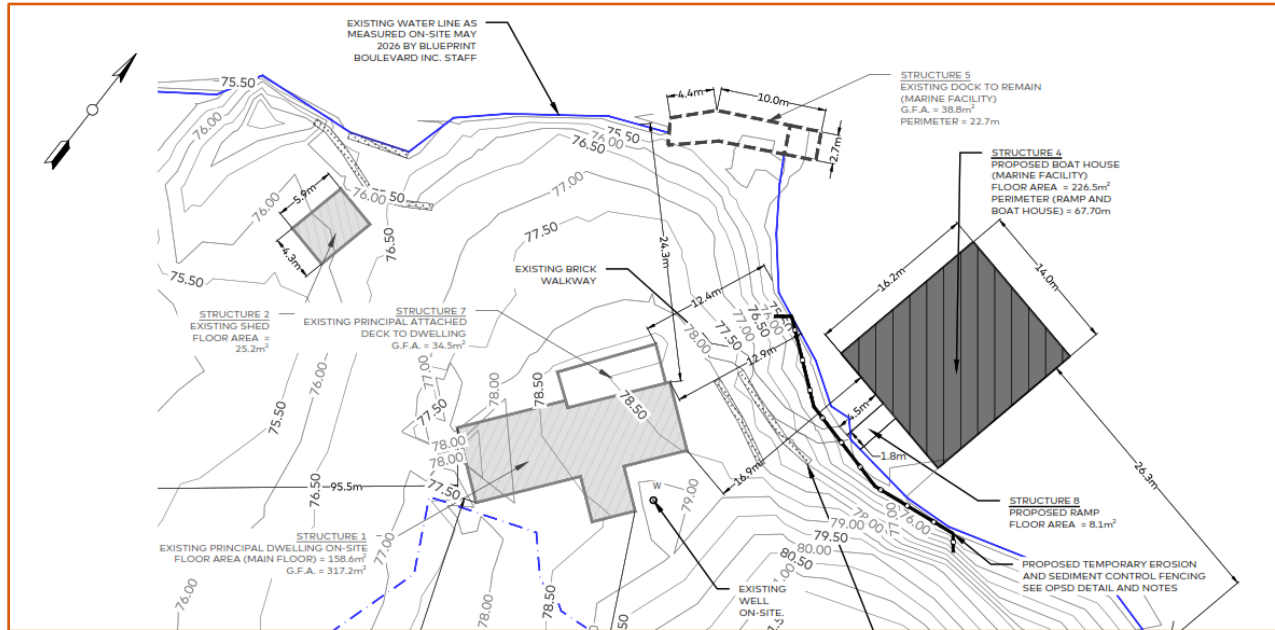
Proposed boathouse shown as Structure 4, proposed ramp shown as Structure 8, and existing dock shown as Structure 5. Site Plan prepared by Blueprint Boulevard Inc.
